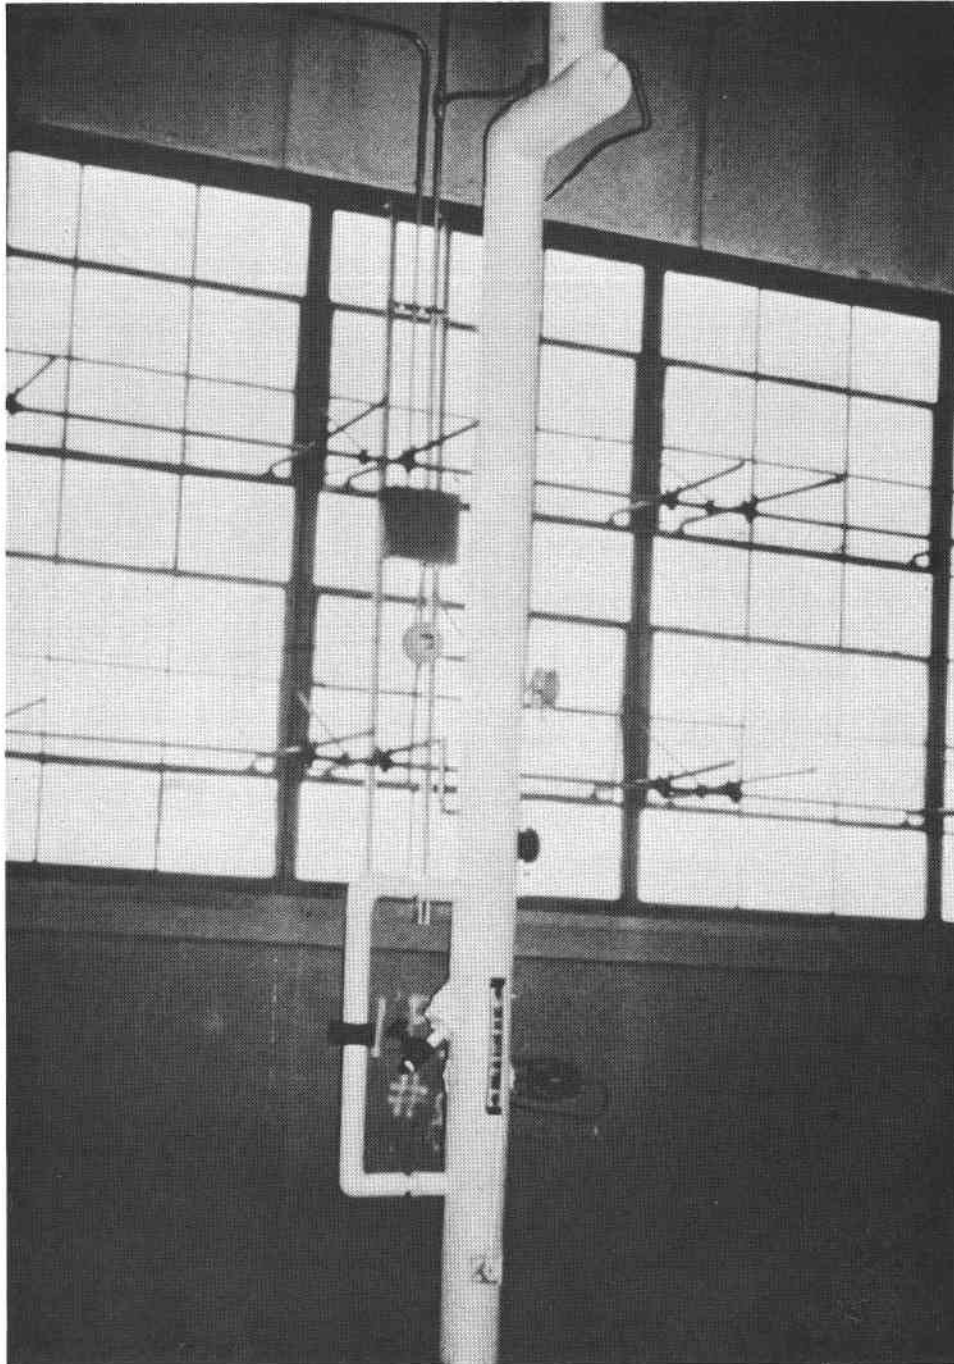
COLLECTOR OUTLET MANIFOLD/RETURN LINE PIPING CONNECTION
